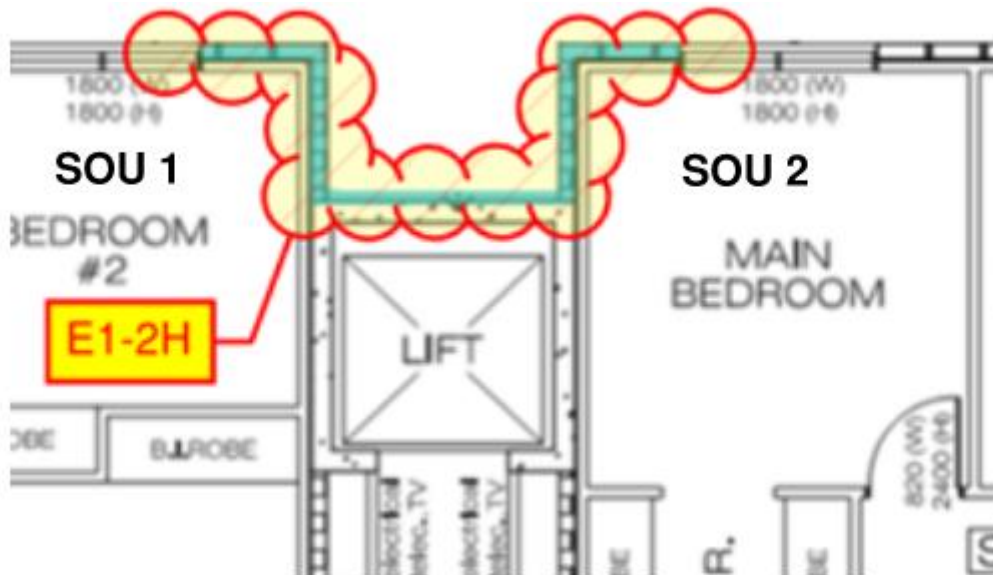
The external wall has cladding that connects two individual SOUs, located either side of masonry lift shaft.
